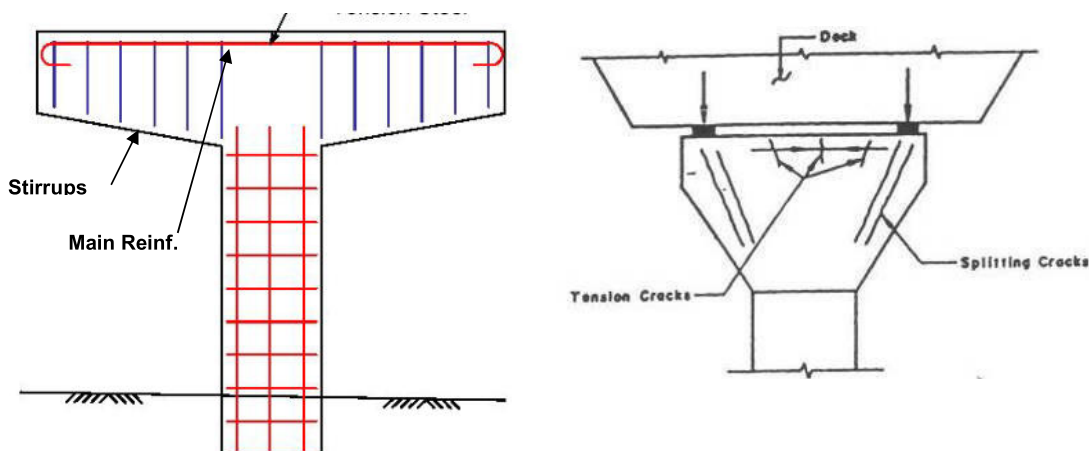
Primary Reinf. and Nature of Cracks in Pier Cap
